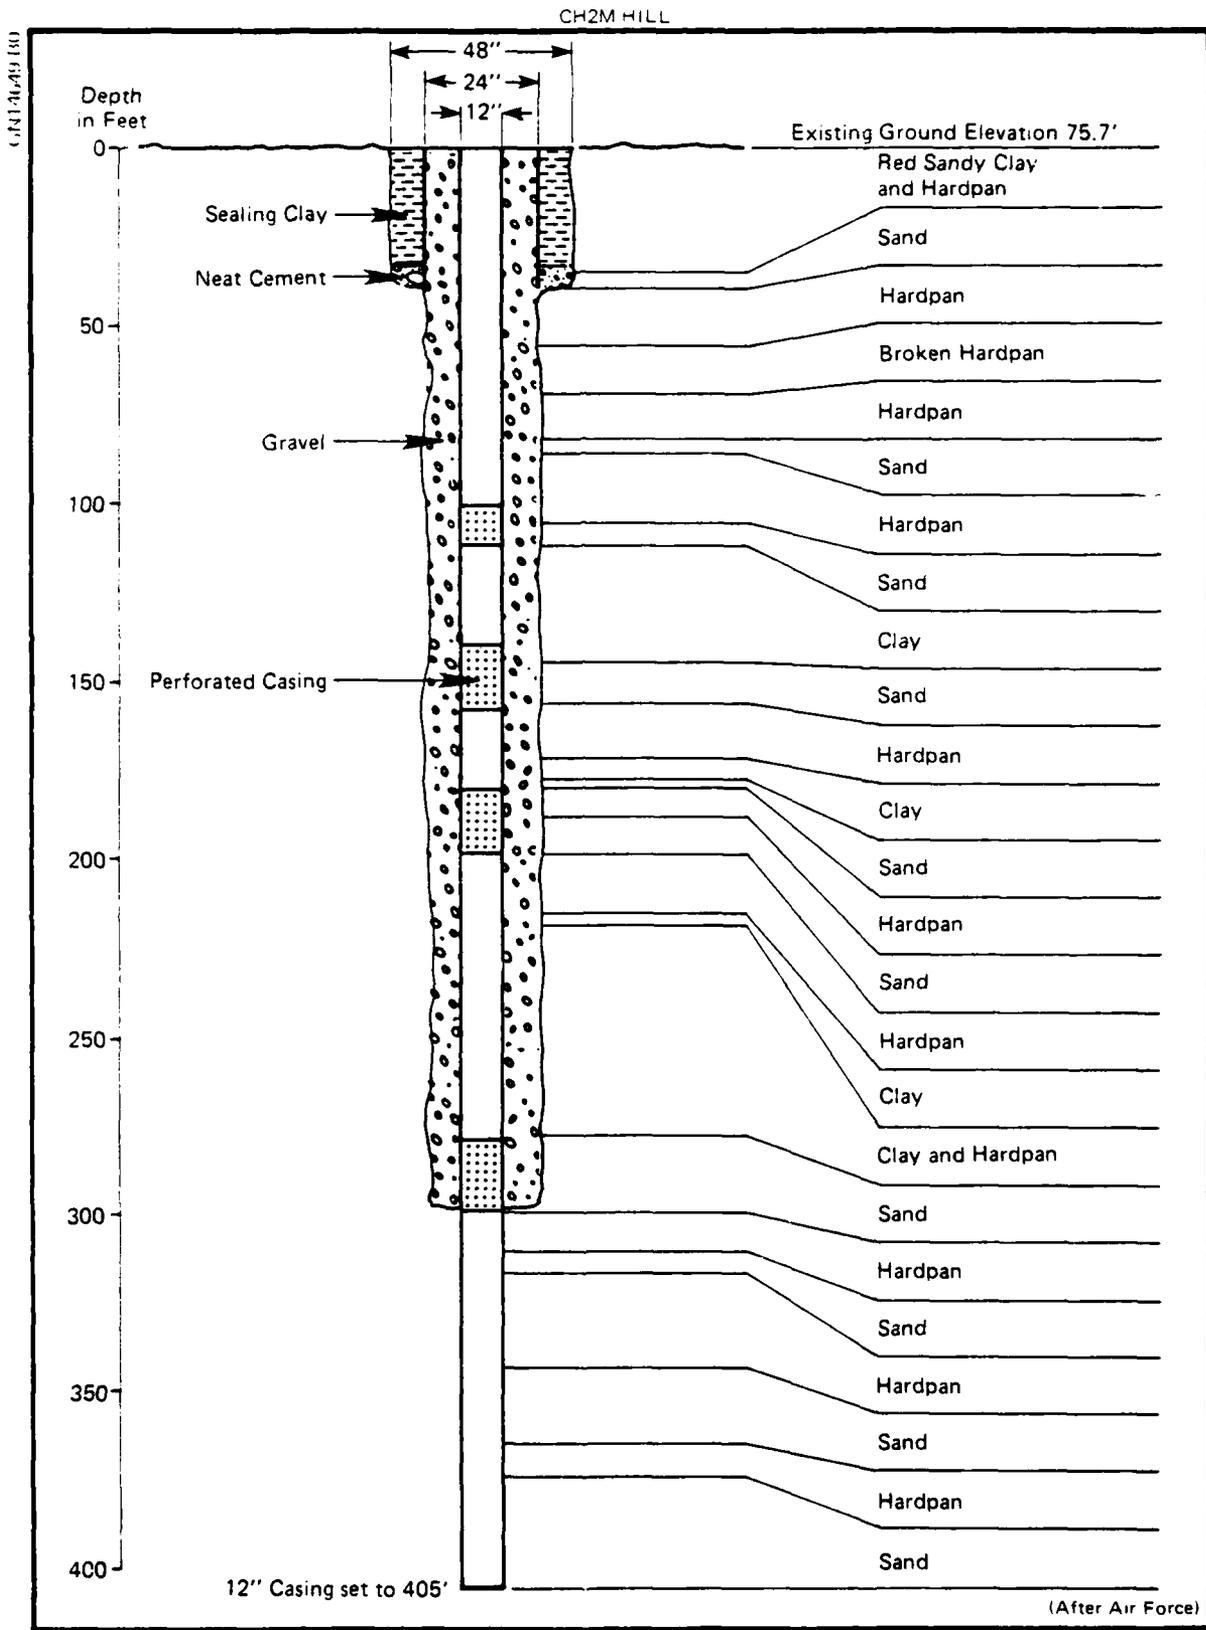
Log and well construction details of Well No. 2 at McClellan AFB.
